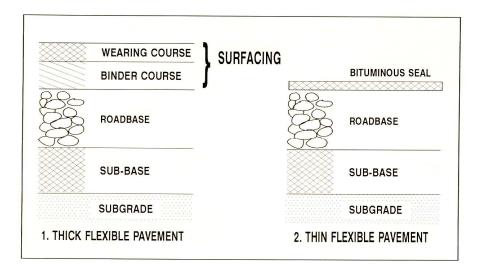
Cross section of a flexible road pavement (IKRAM, 1994)
